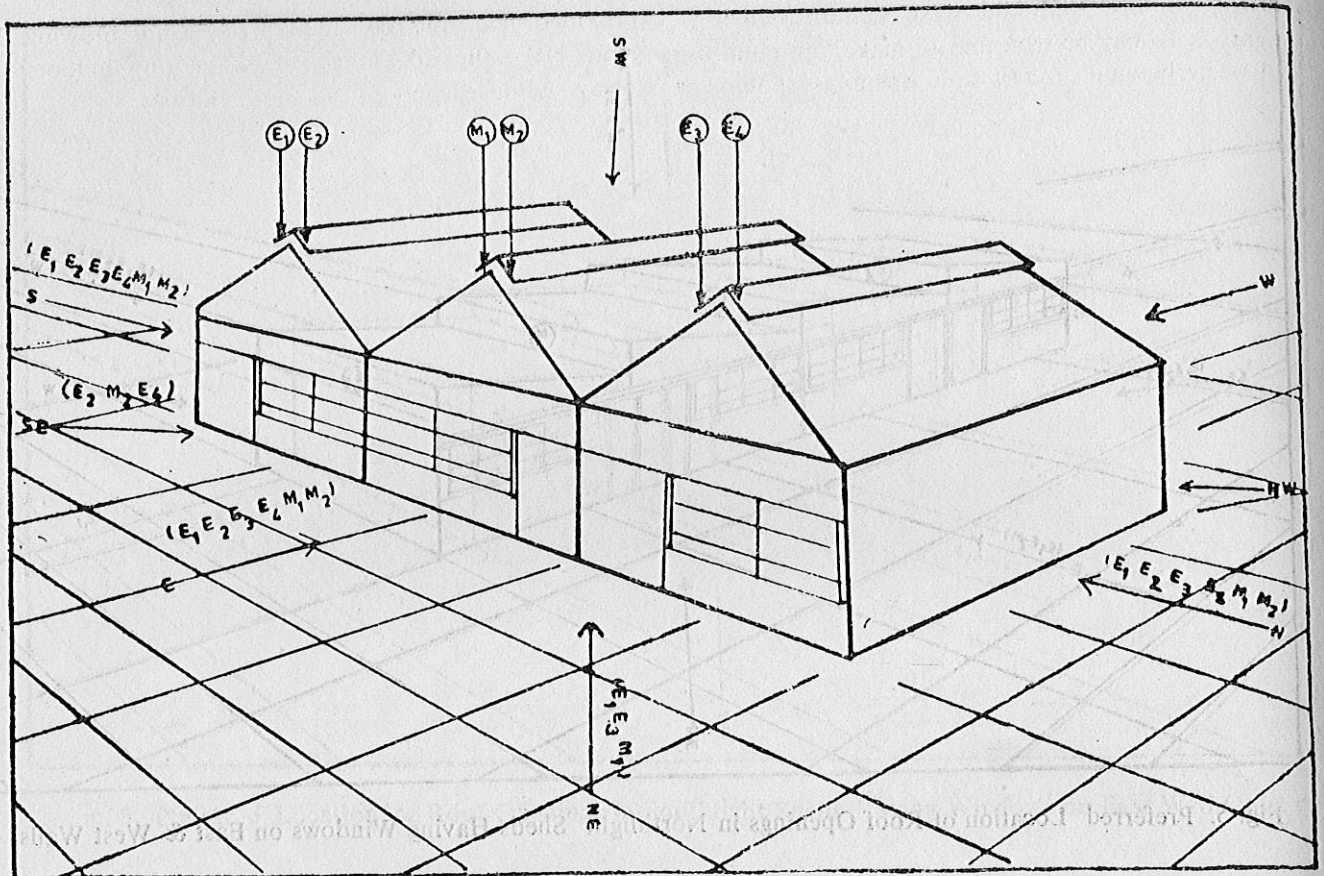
Preferred Location of Roof Openings in Pitched Roof Sheds Having Windows on one Wall Only. (East Wall).
